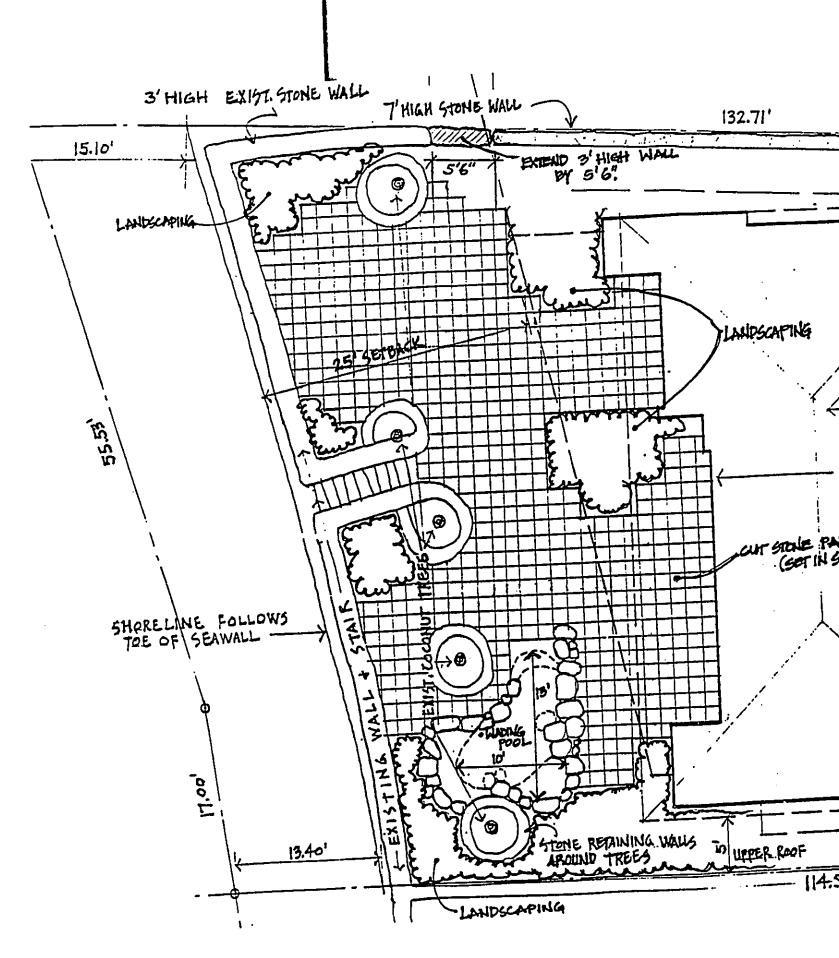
Existing Site Plan & Site Conditions Ihle Residence Lahaina, Maui, Hawaii
